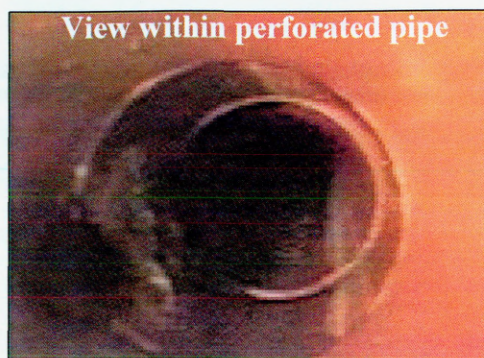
Clean inlet to infiltration trench in Figure 4-7
